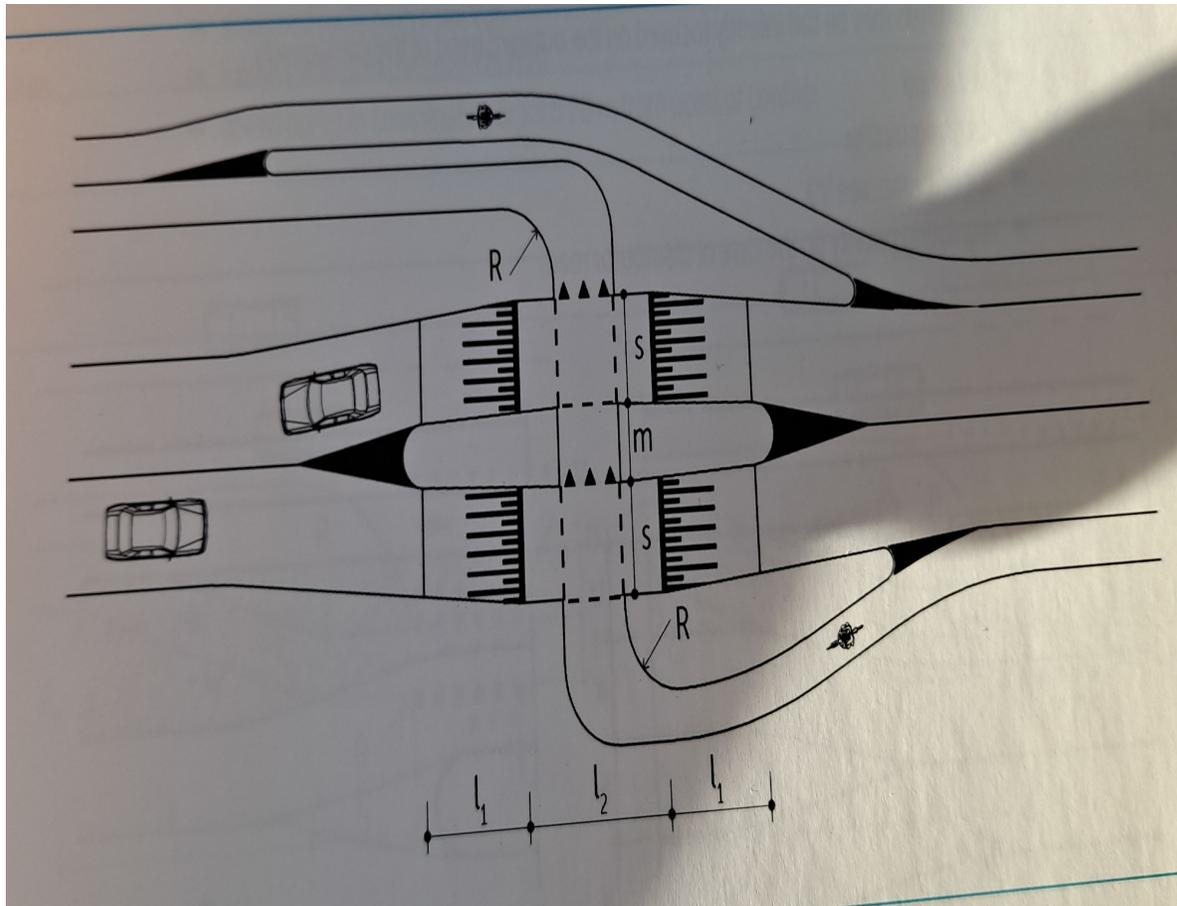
Bend Out Crossing (minor road AADT <4,000)
